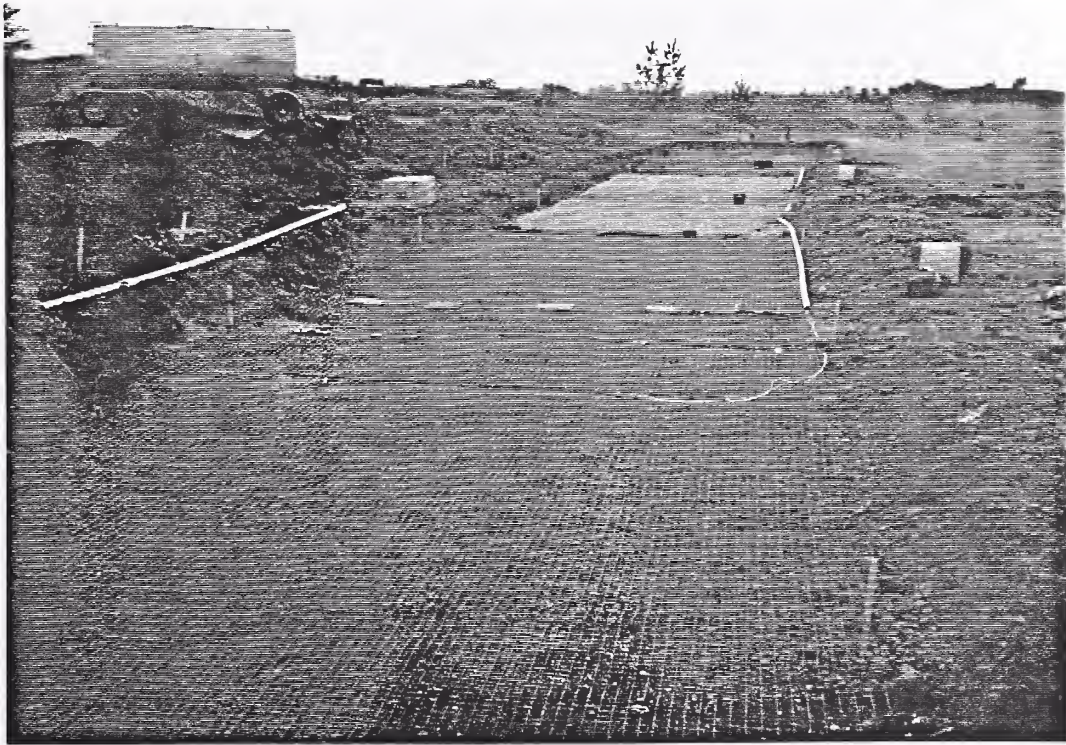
Test Section Showing Geogrid and Geotextile Prior to Placement of Base Course
